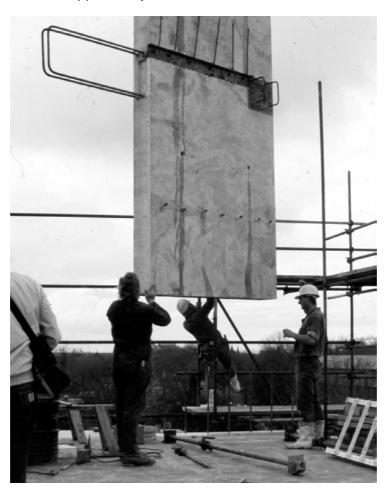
Interior wall-floor slab connection detail: Partitioned wall with horizontal joint
